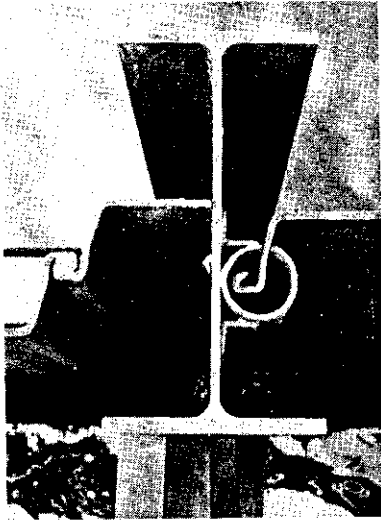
Driven sheet piles in the case of K·H A type; the first sheet pile is cut in two pieces and welded to the main post (left side), and another end is driven into a small slit pipe (right side)
